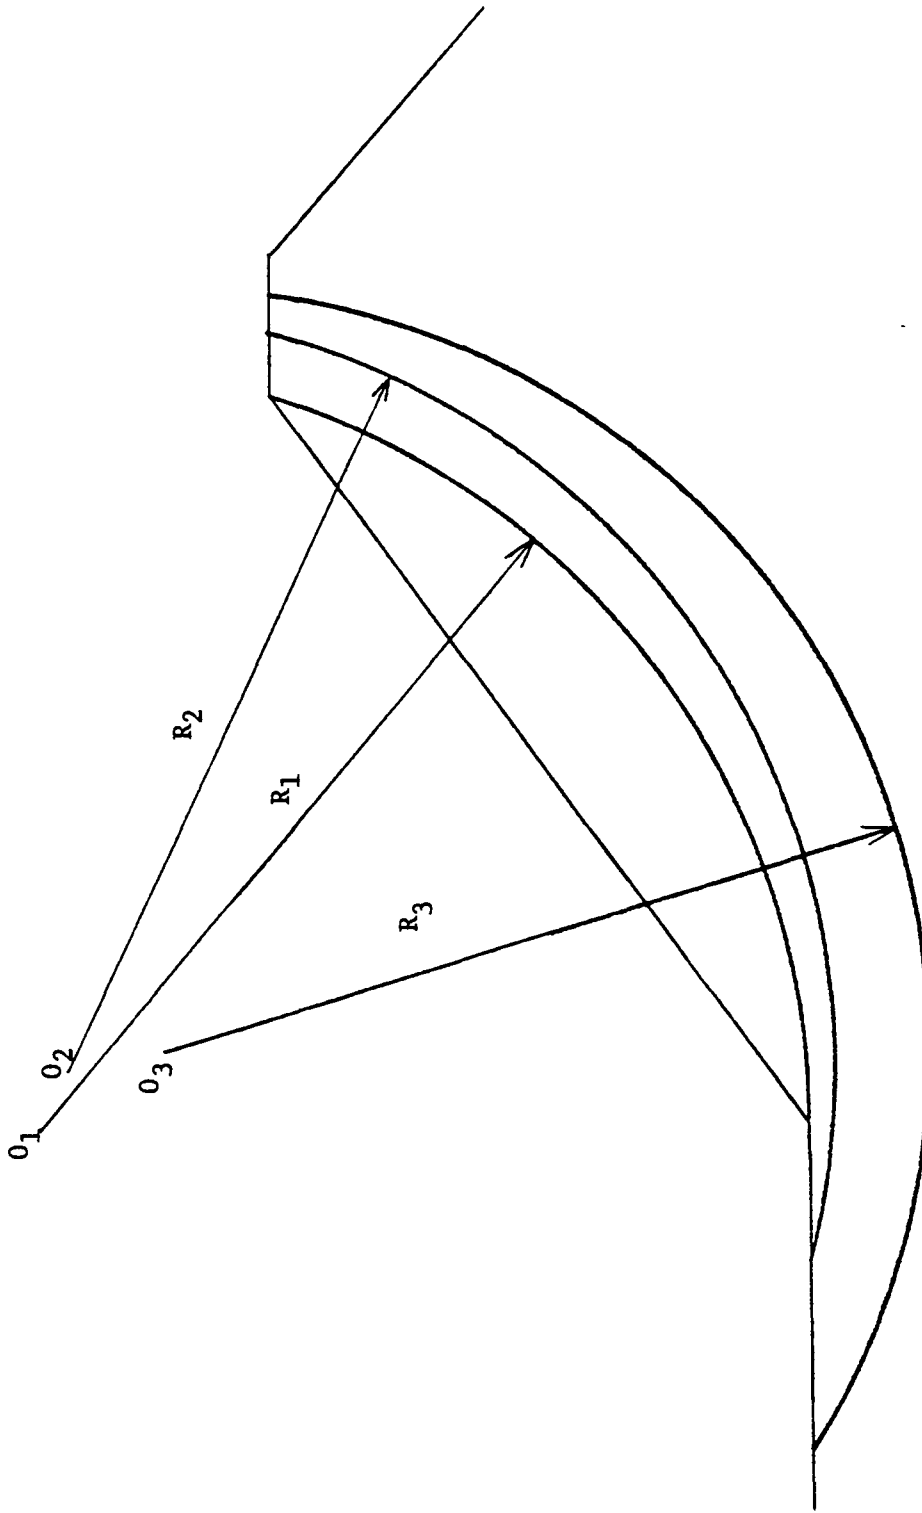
Assumed failure surfaces used in analyzing the stability of embankments.
